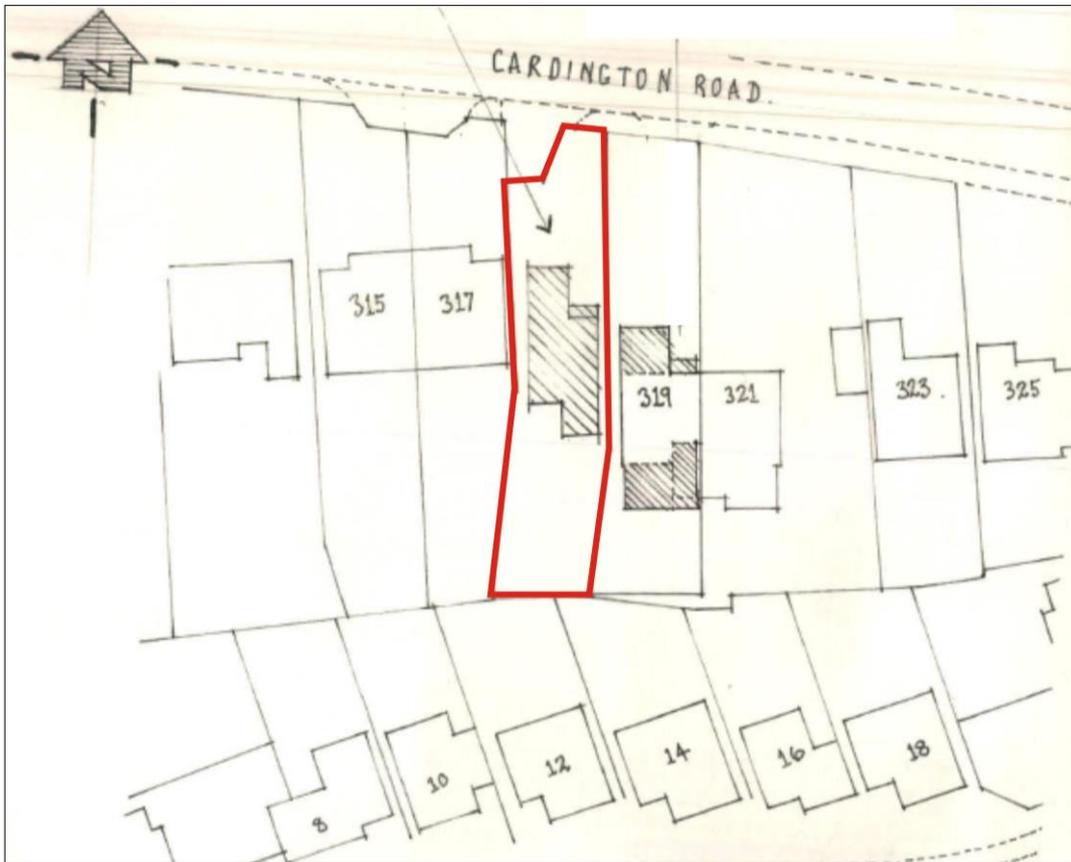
Red Line Boundary showing location of new dwelling (site plan provided by the client)
